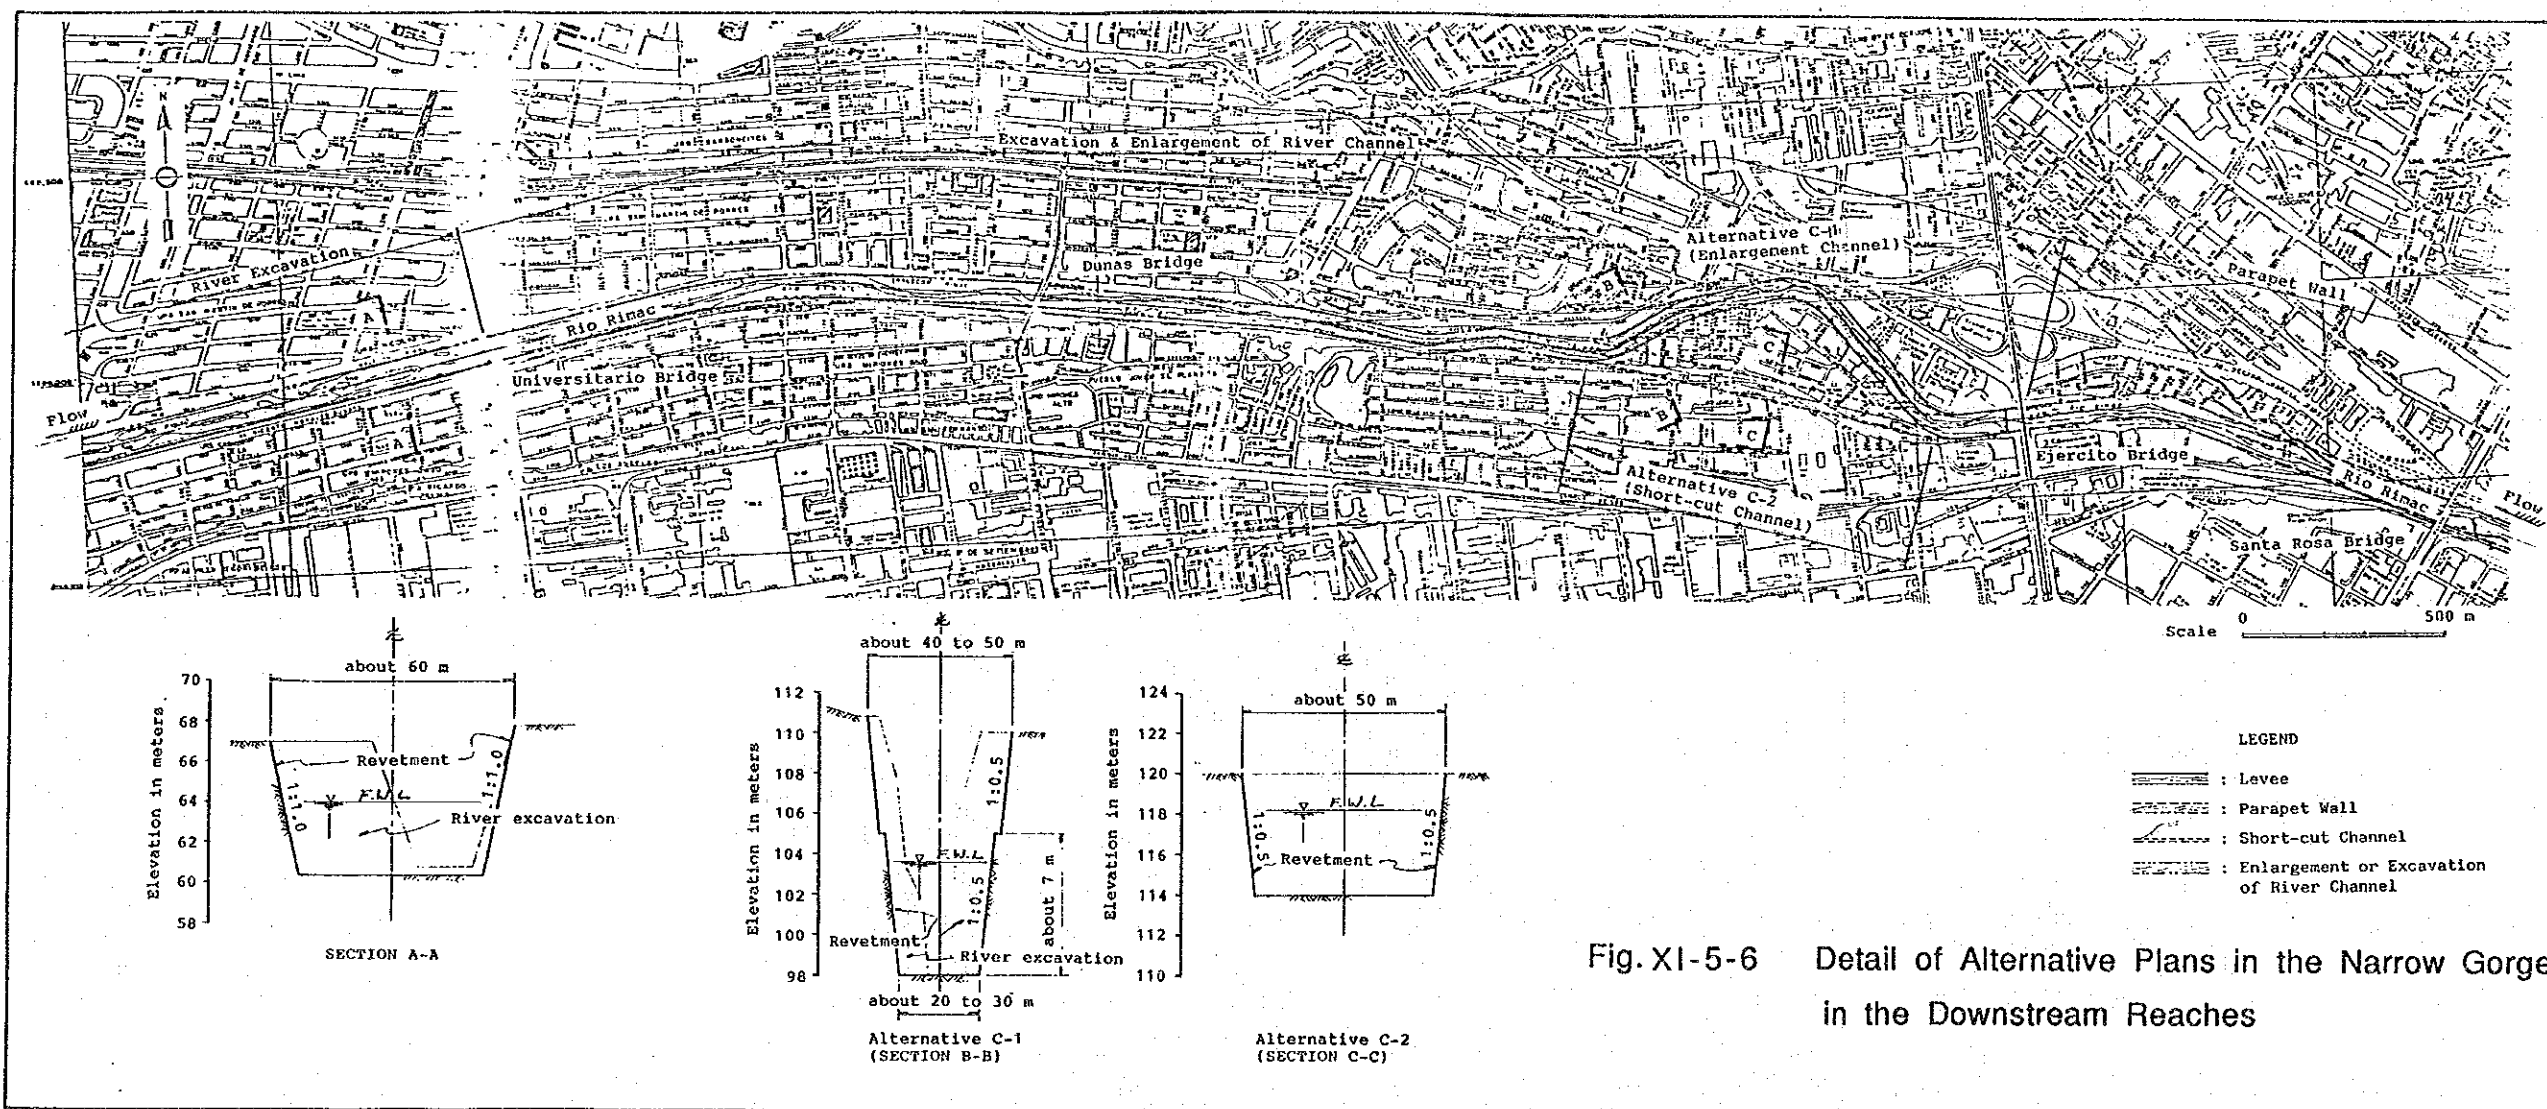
Detail of Alternative Plans in the Narrow Gorge in the Downstream Reaches
